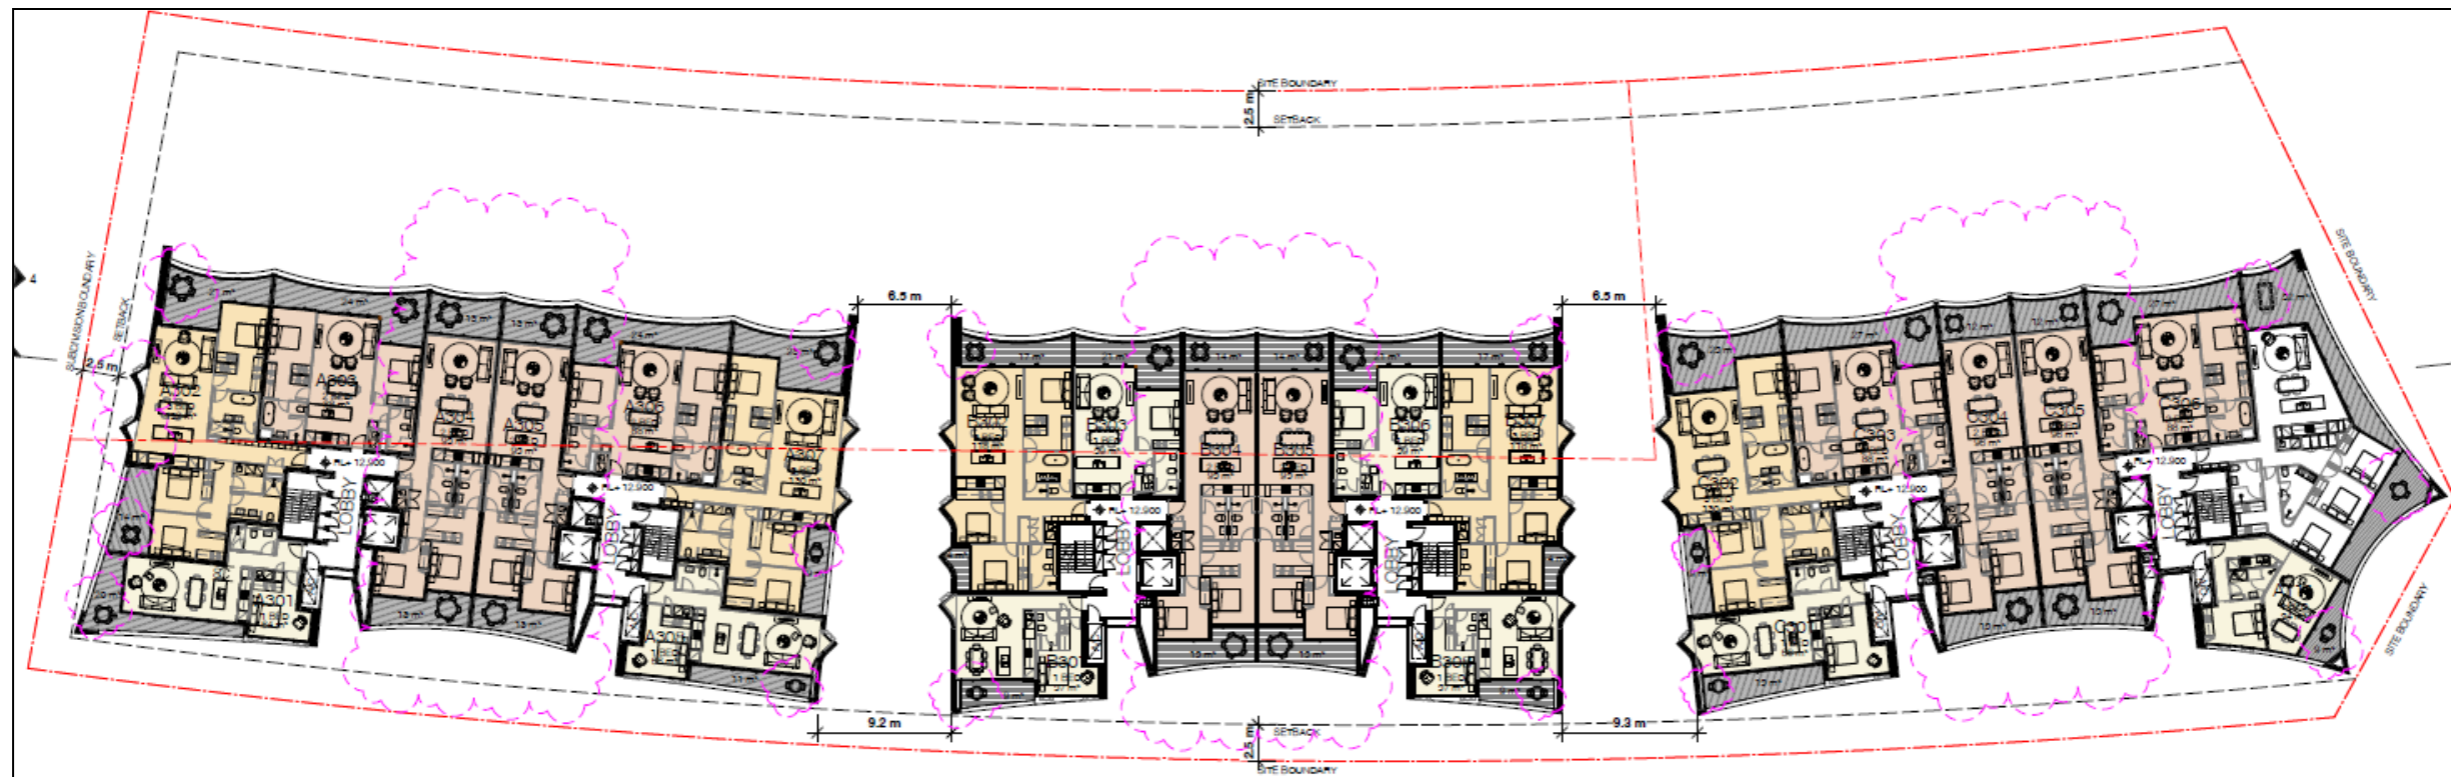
level 3 to 6 floor plan (Source: Applicant's architectural plans)
